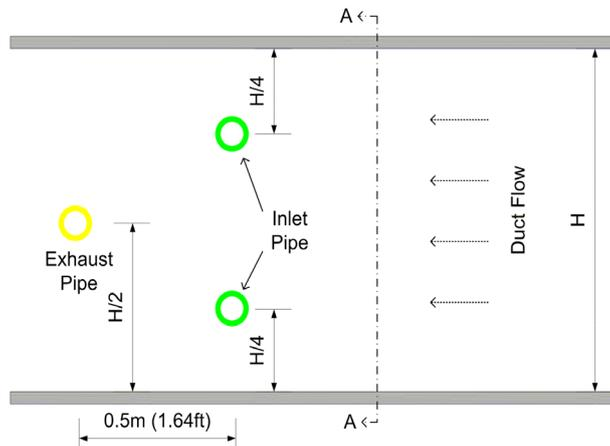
Side view of the inlet and exhaust pipe positions for a large duct.
